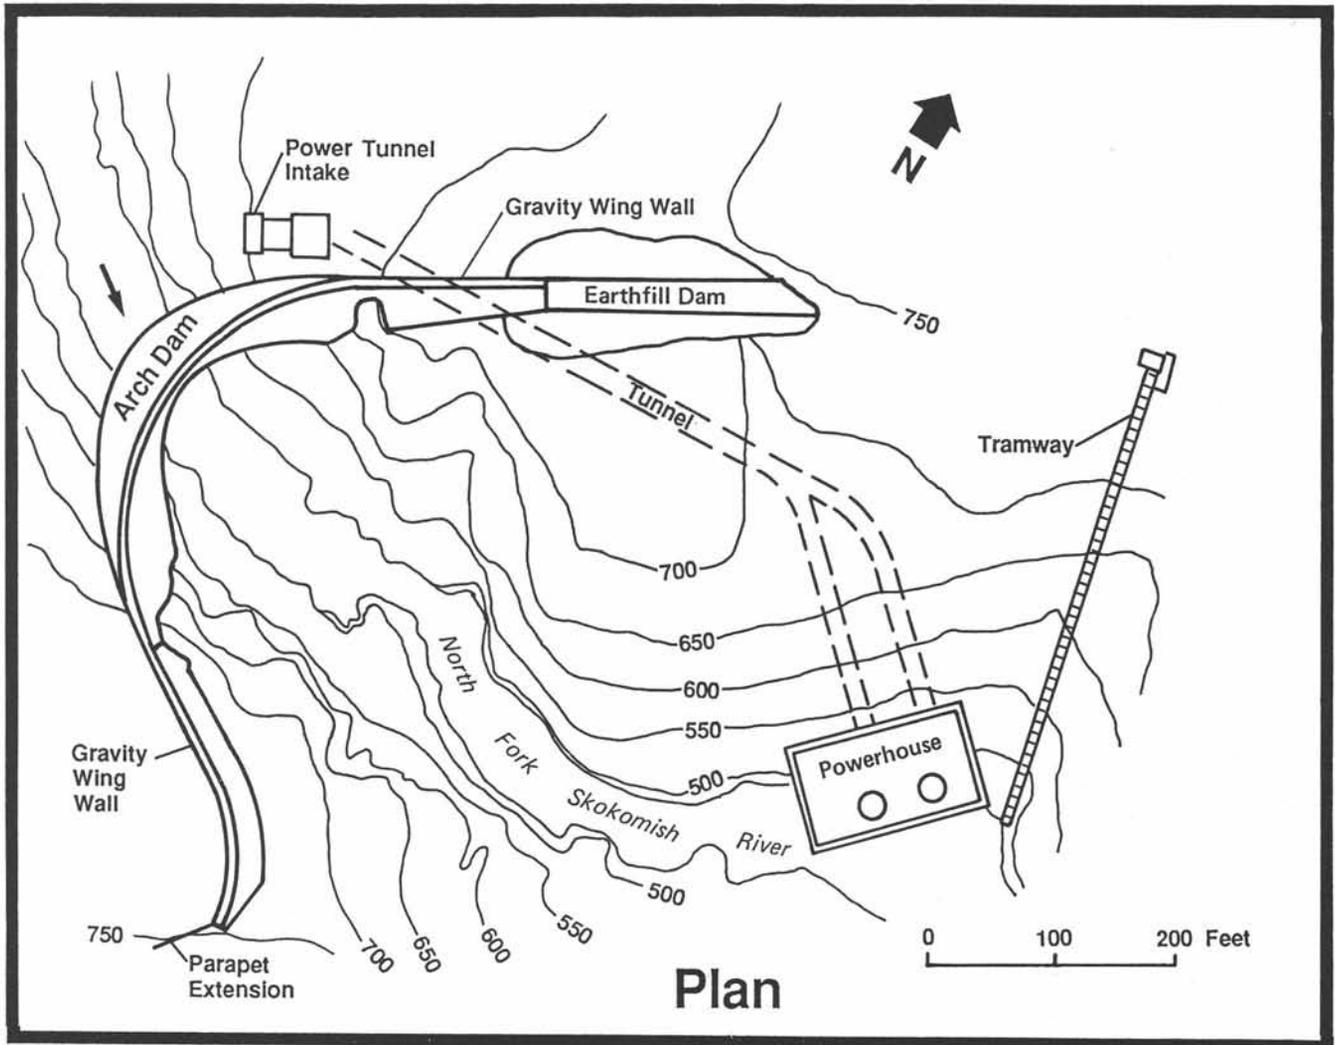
Plan view of Cushman Dam No. 1 showing the sharp curve to the arch in relation to the abutments. There is little rock exposed on the right abutment away from the concrete dam.
